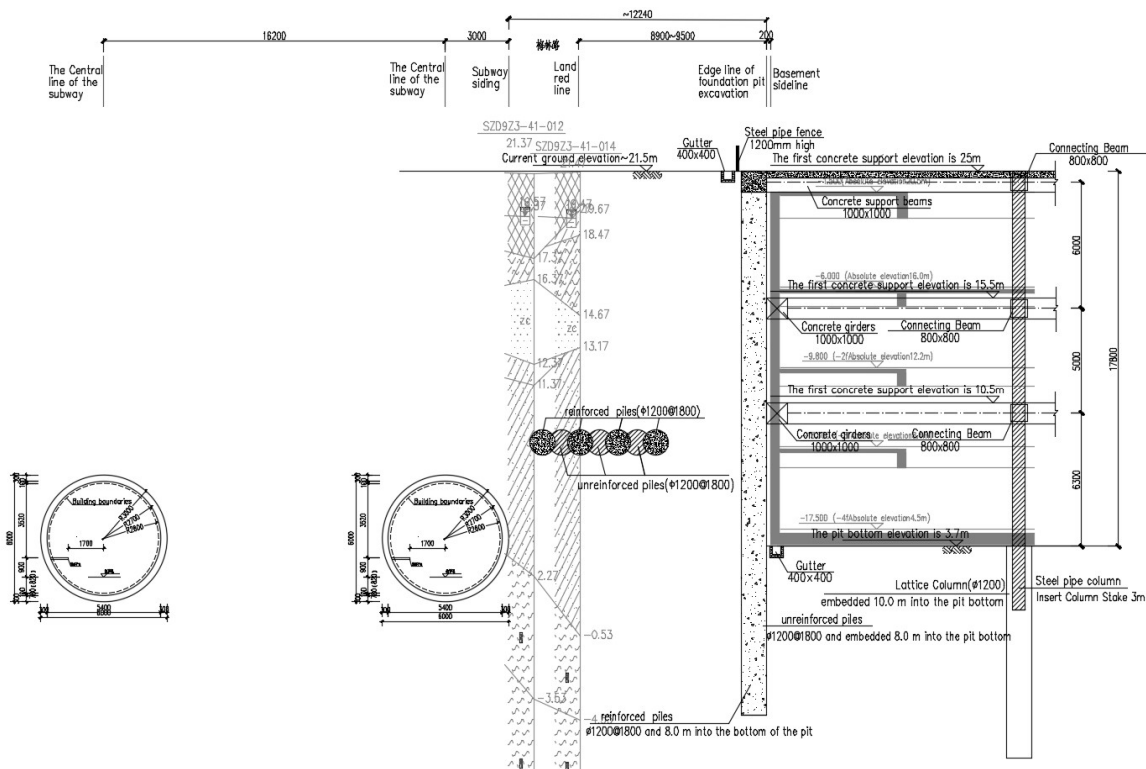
Cross-Section Diagram of the Foundation Pit Retaining Structure and the Subway Tunnel
